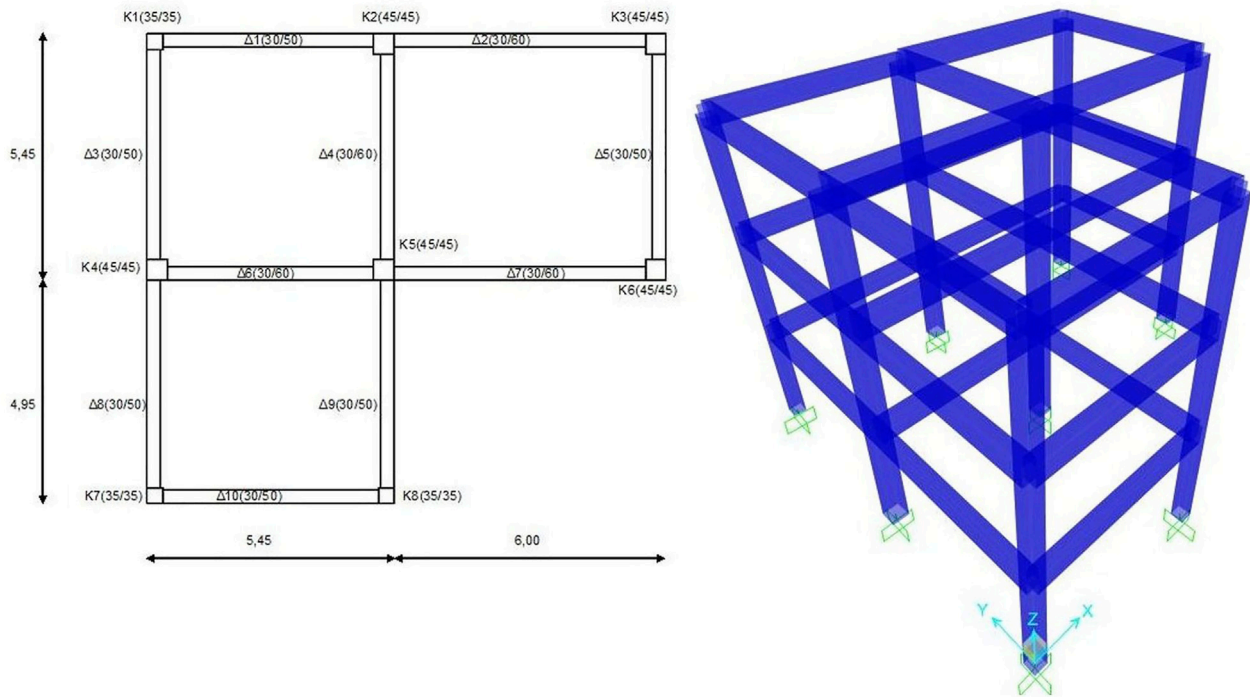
| Typical floor plan of the case study building structure and its simulation.
